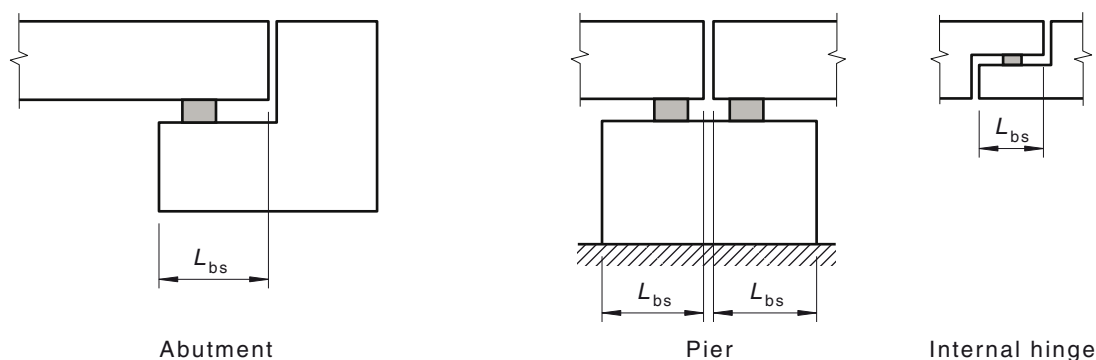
OVERLAP LENGTH L_{bs}
